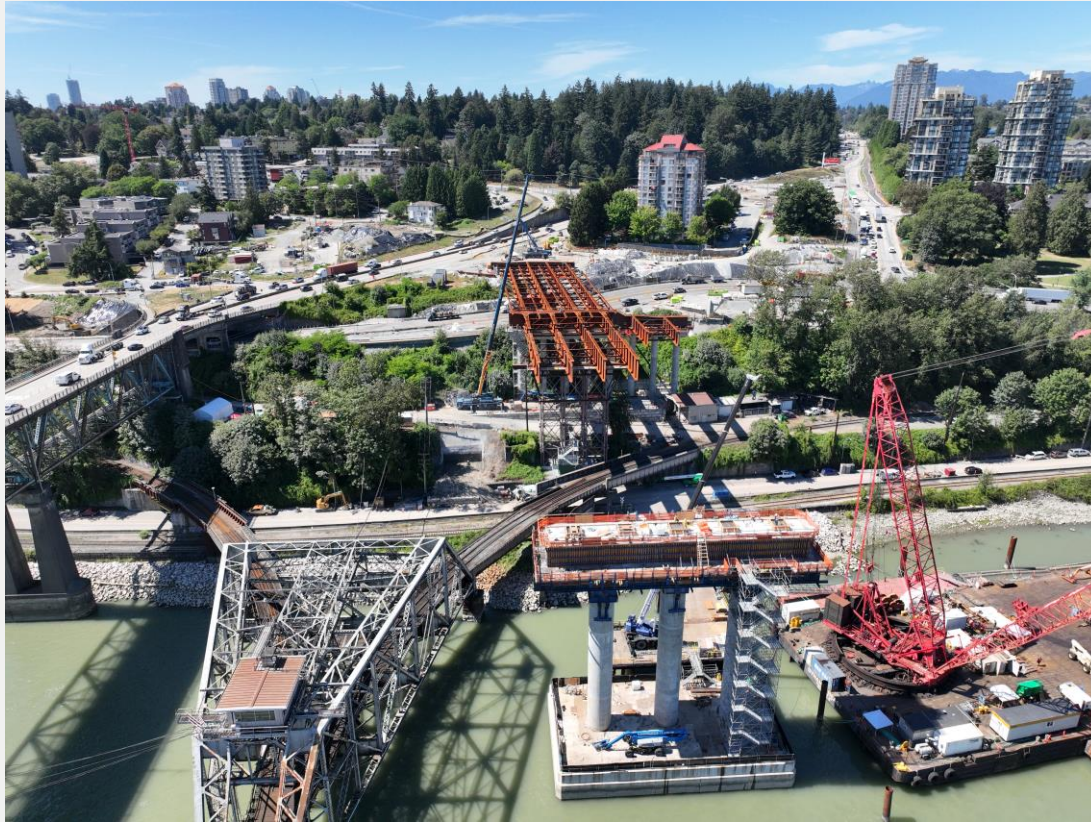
N1 Pier Cap construction and girder installation across Front Street
